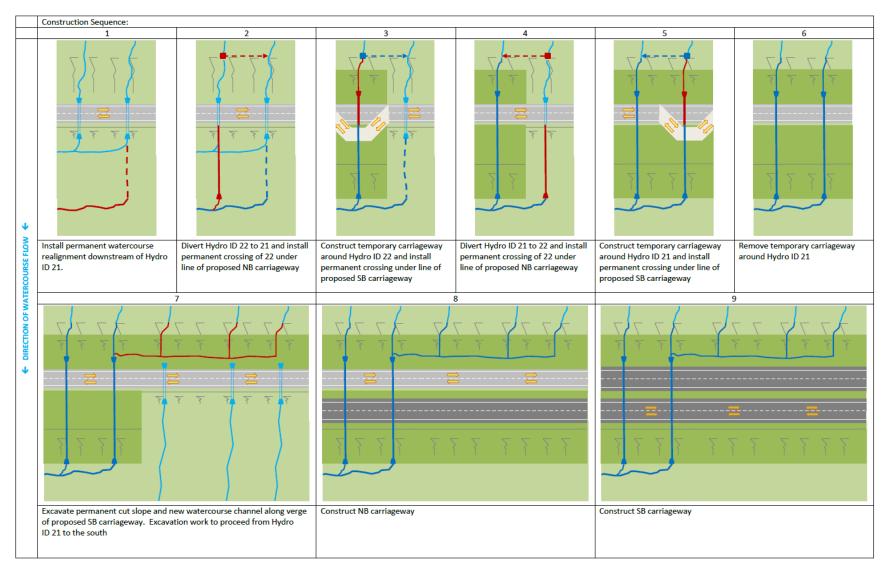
On-line watercourse alignment – widening to the east (road in cutting) and widening to the west (road on embankment)
